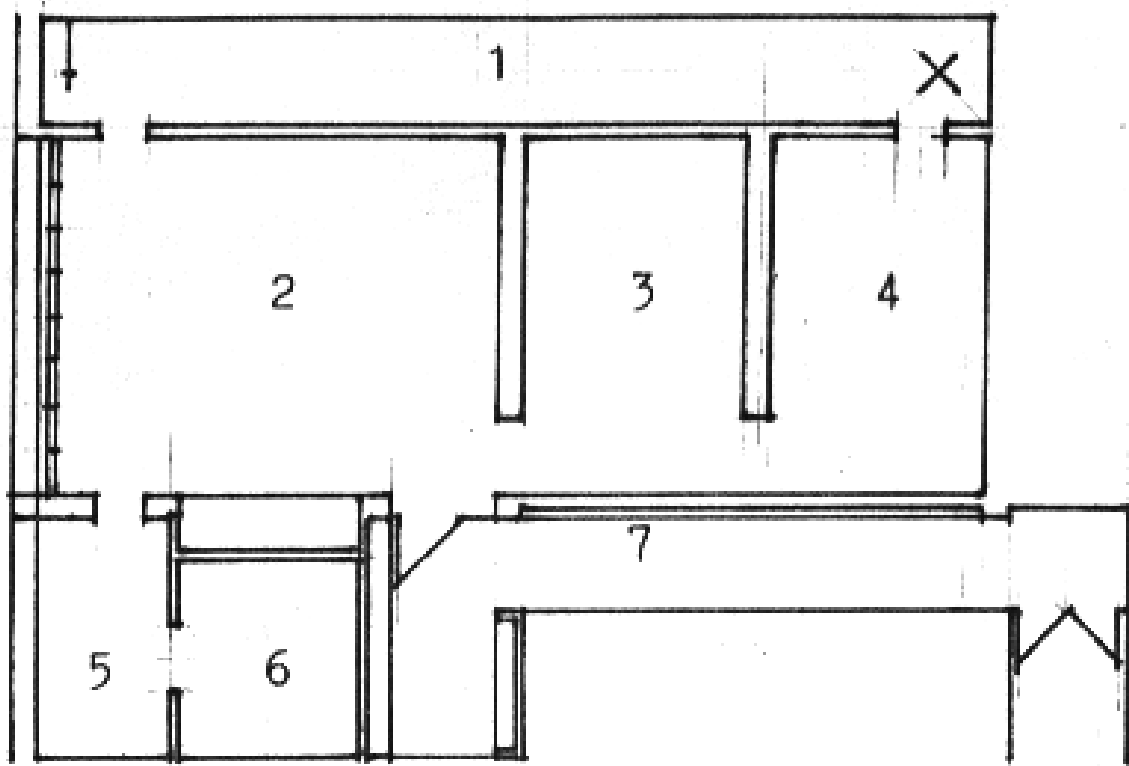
Ground-floor Plan (#1 Light Measuring Track / #2 Daylight Room / #3 White Room / #4 Black Room / #5 Working Room / #6 Artificial Sky / #7 Fore-zone).
